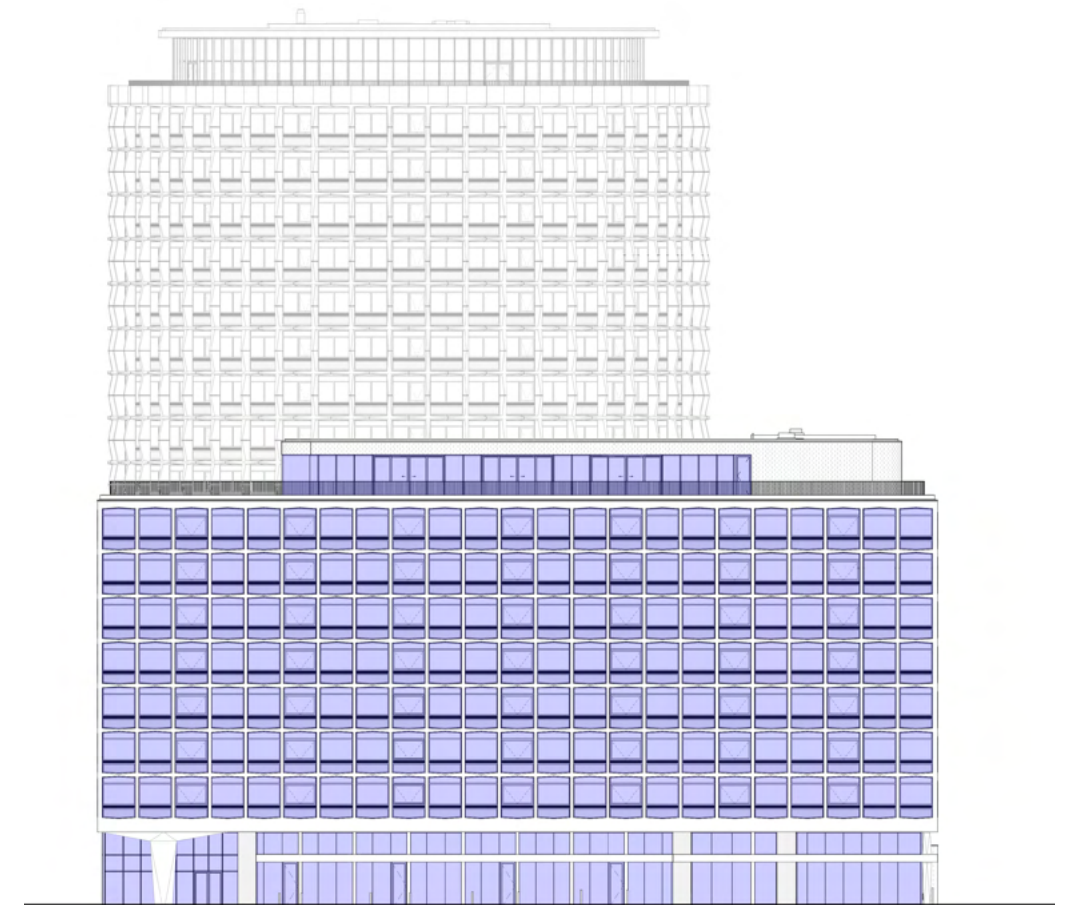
Kingsway West Elevation - MAT 06 location
